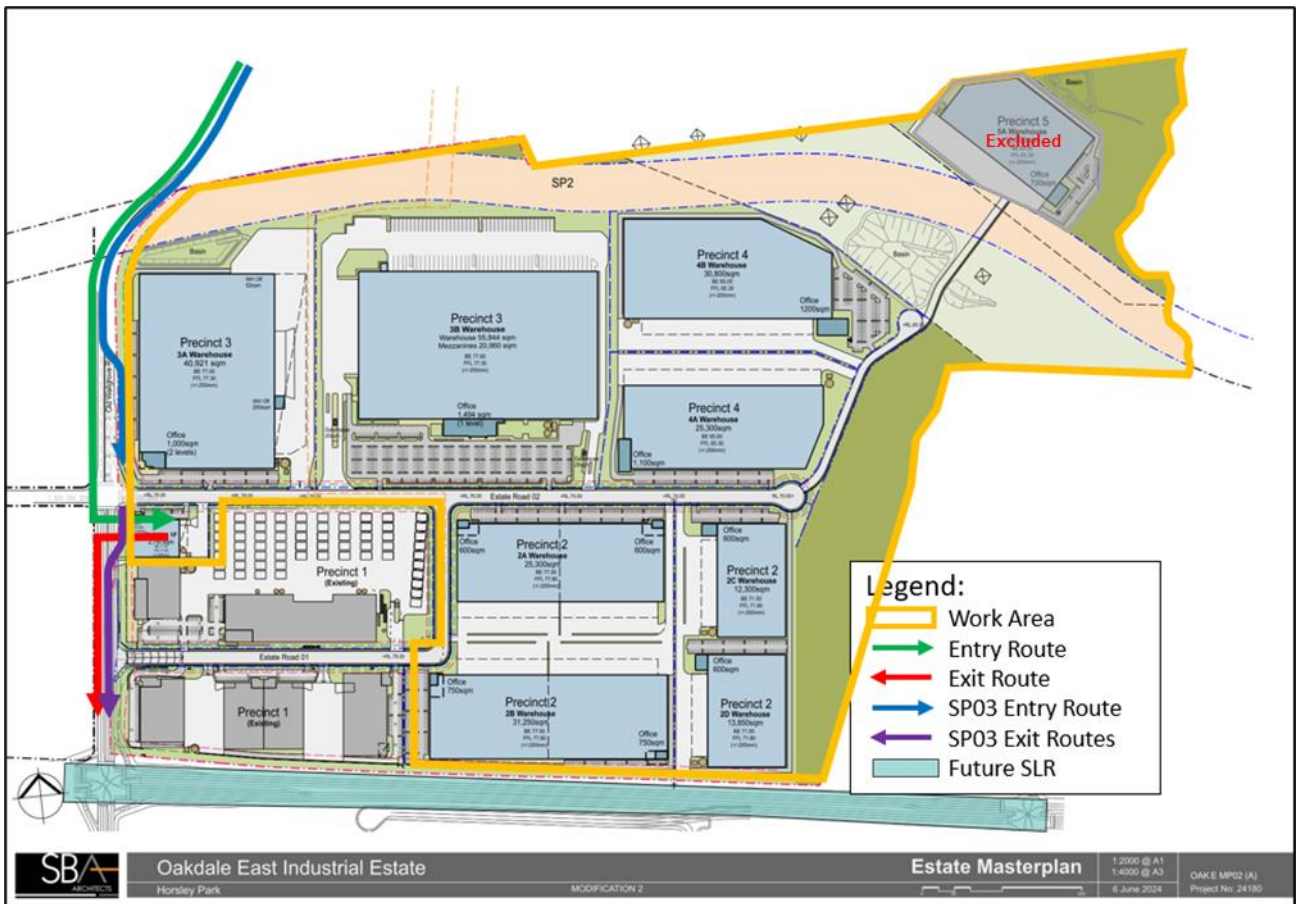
Access Arrangements (During Stage 4 – Milner Ave/Old Wallgrove Road Intersection)
